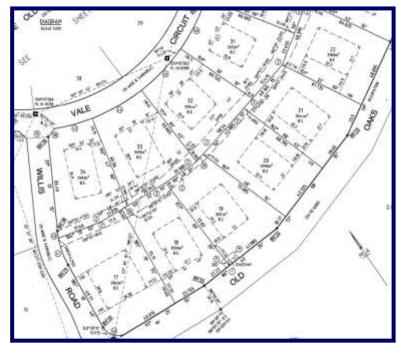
Registered building envelopes for subject lot (Lot 32) and surrounding lots
